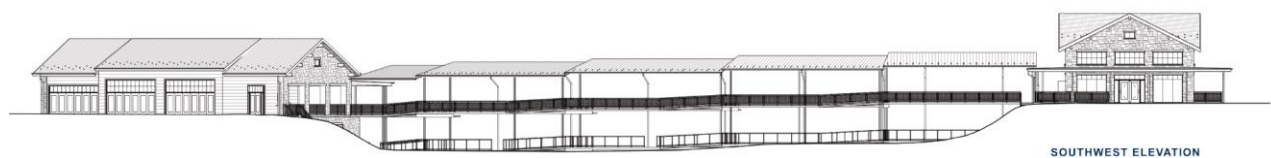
Alternative 2: Proposed clubhouse (right), driving range (center), and cart barn (left), southwest elevation.
